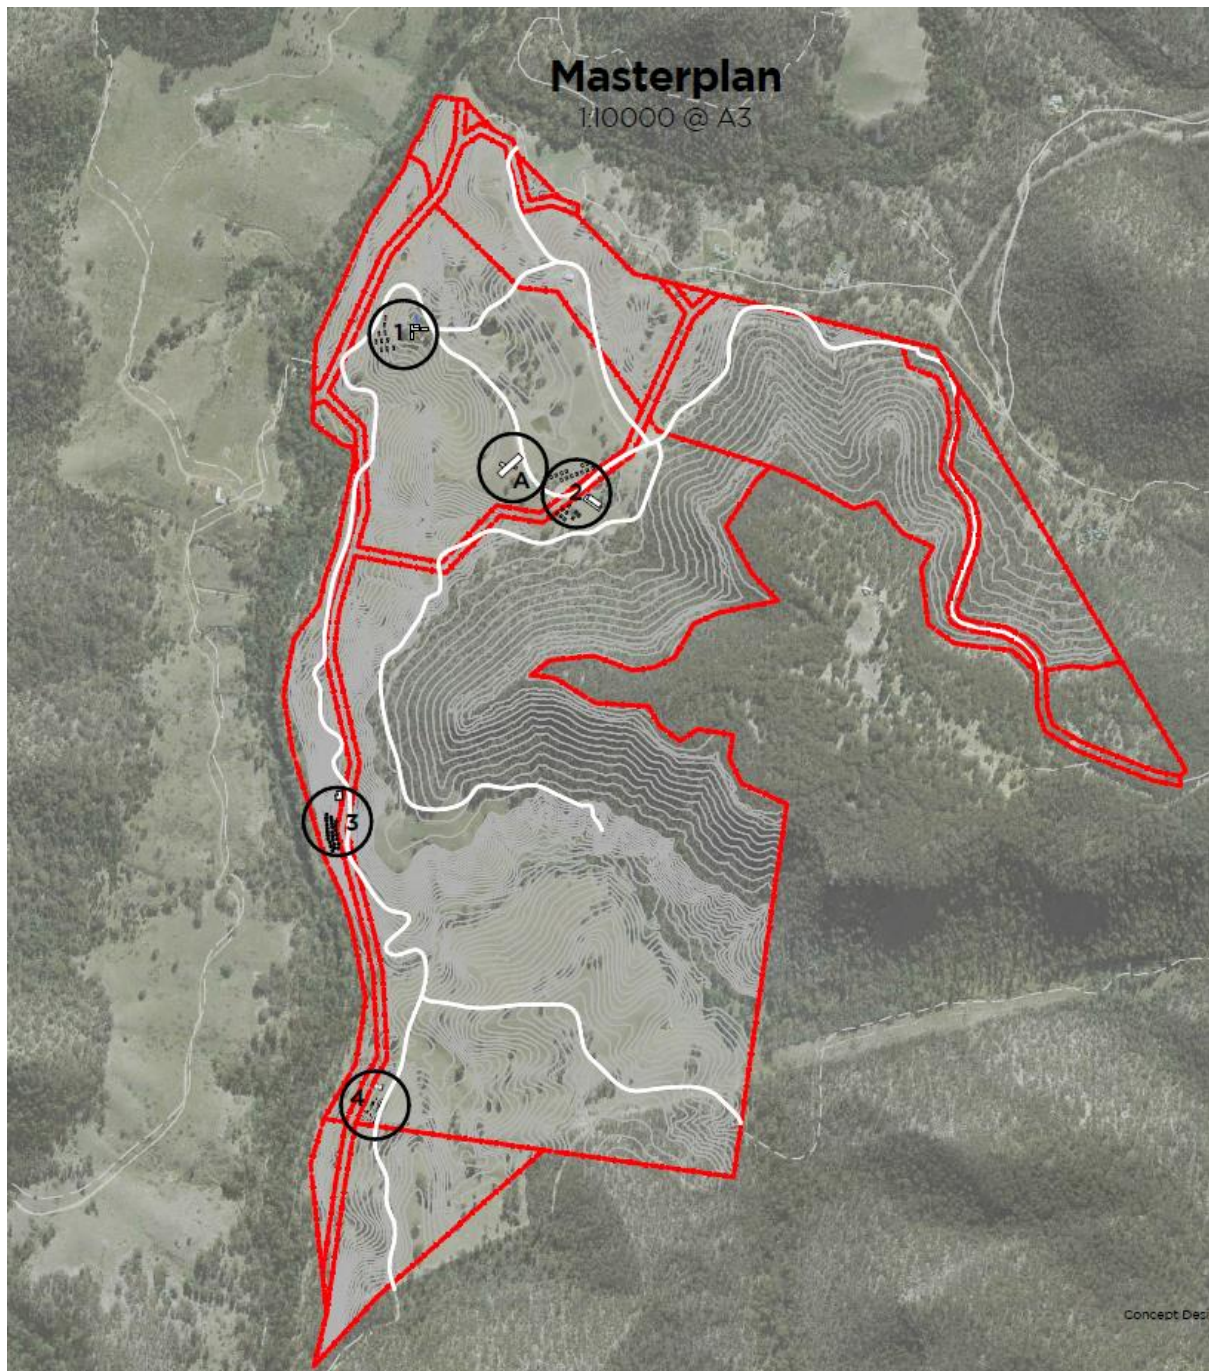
Concept masterplan showing locations of proposed facilities
